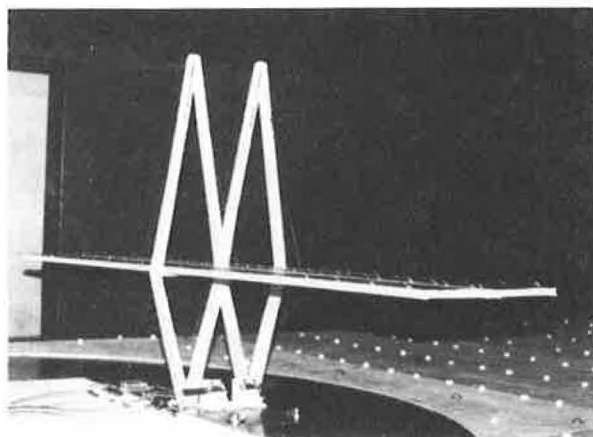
Construction Stage Wind Tunnel Model prior to reaching the Anchor Pier, from Ref. (3)
